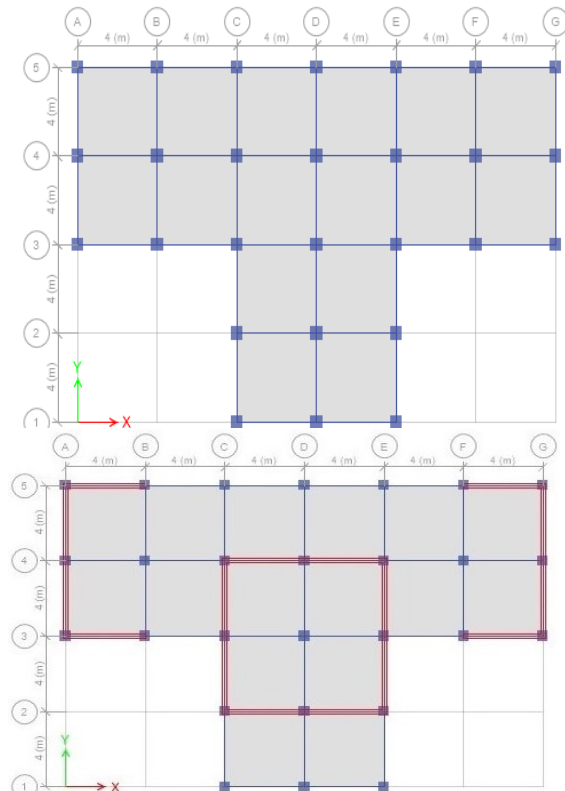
Plan of irregular structure T2 representing bare frame and frame with bracings and infill walls
